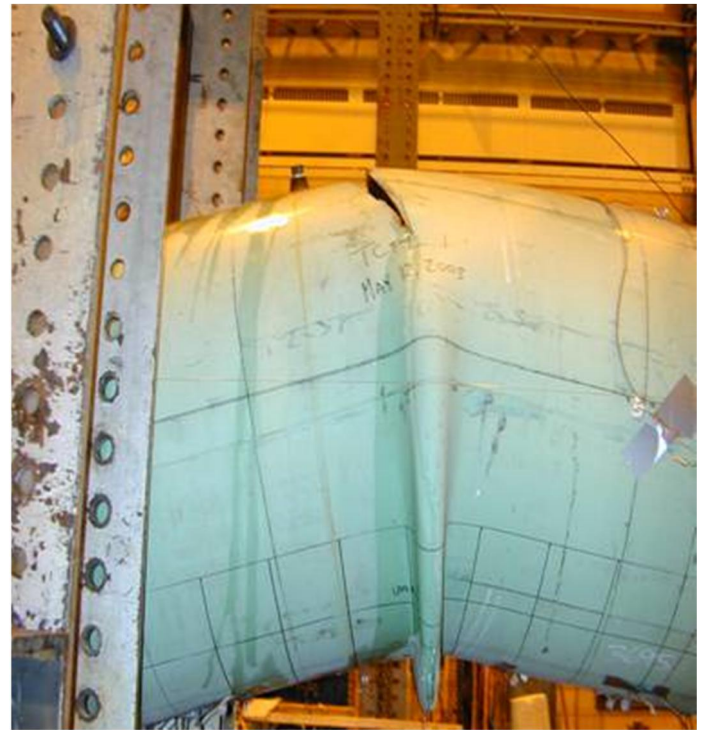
Wrinkle and Fracture of the Test Specimen [1]
